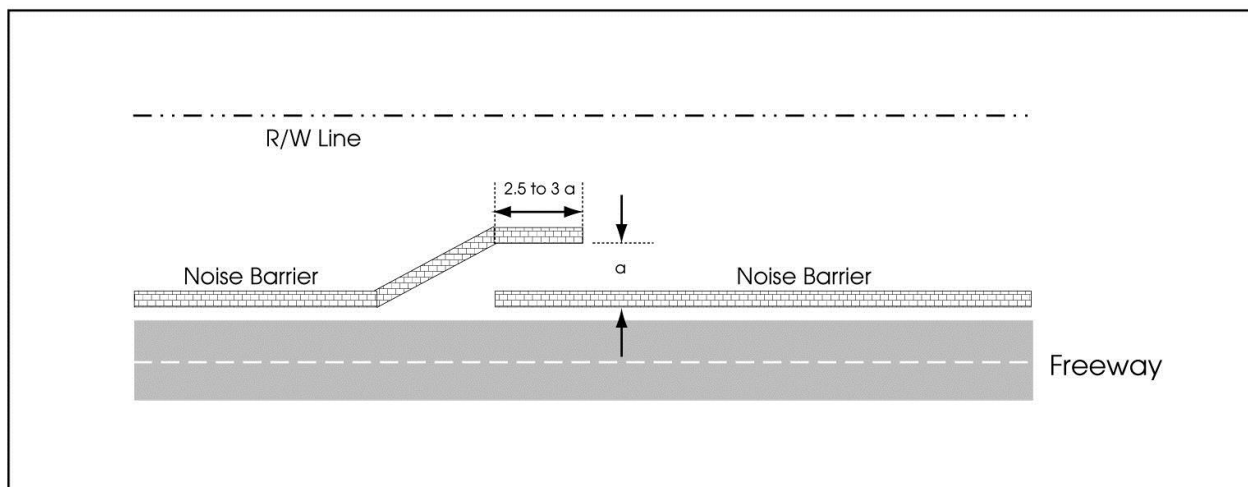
Barrier Overlap Offset 2.5 to 3 Times the Width of the Access Opening
